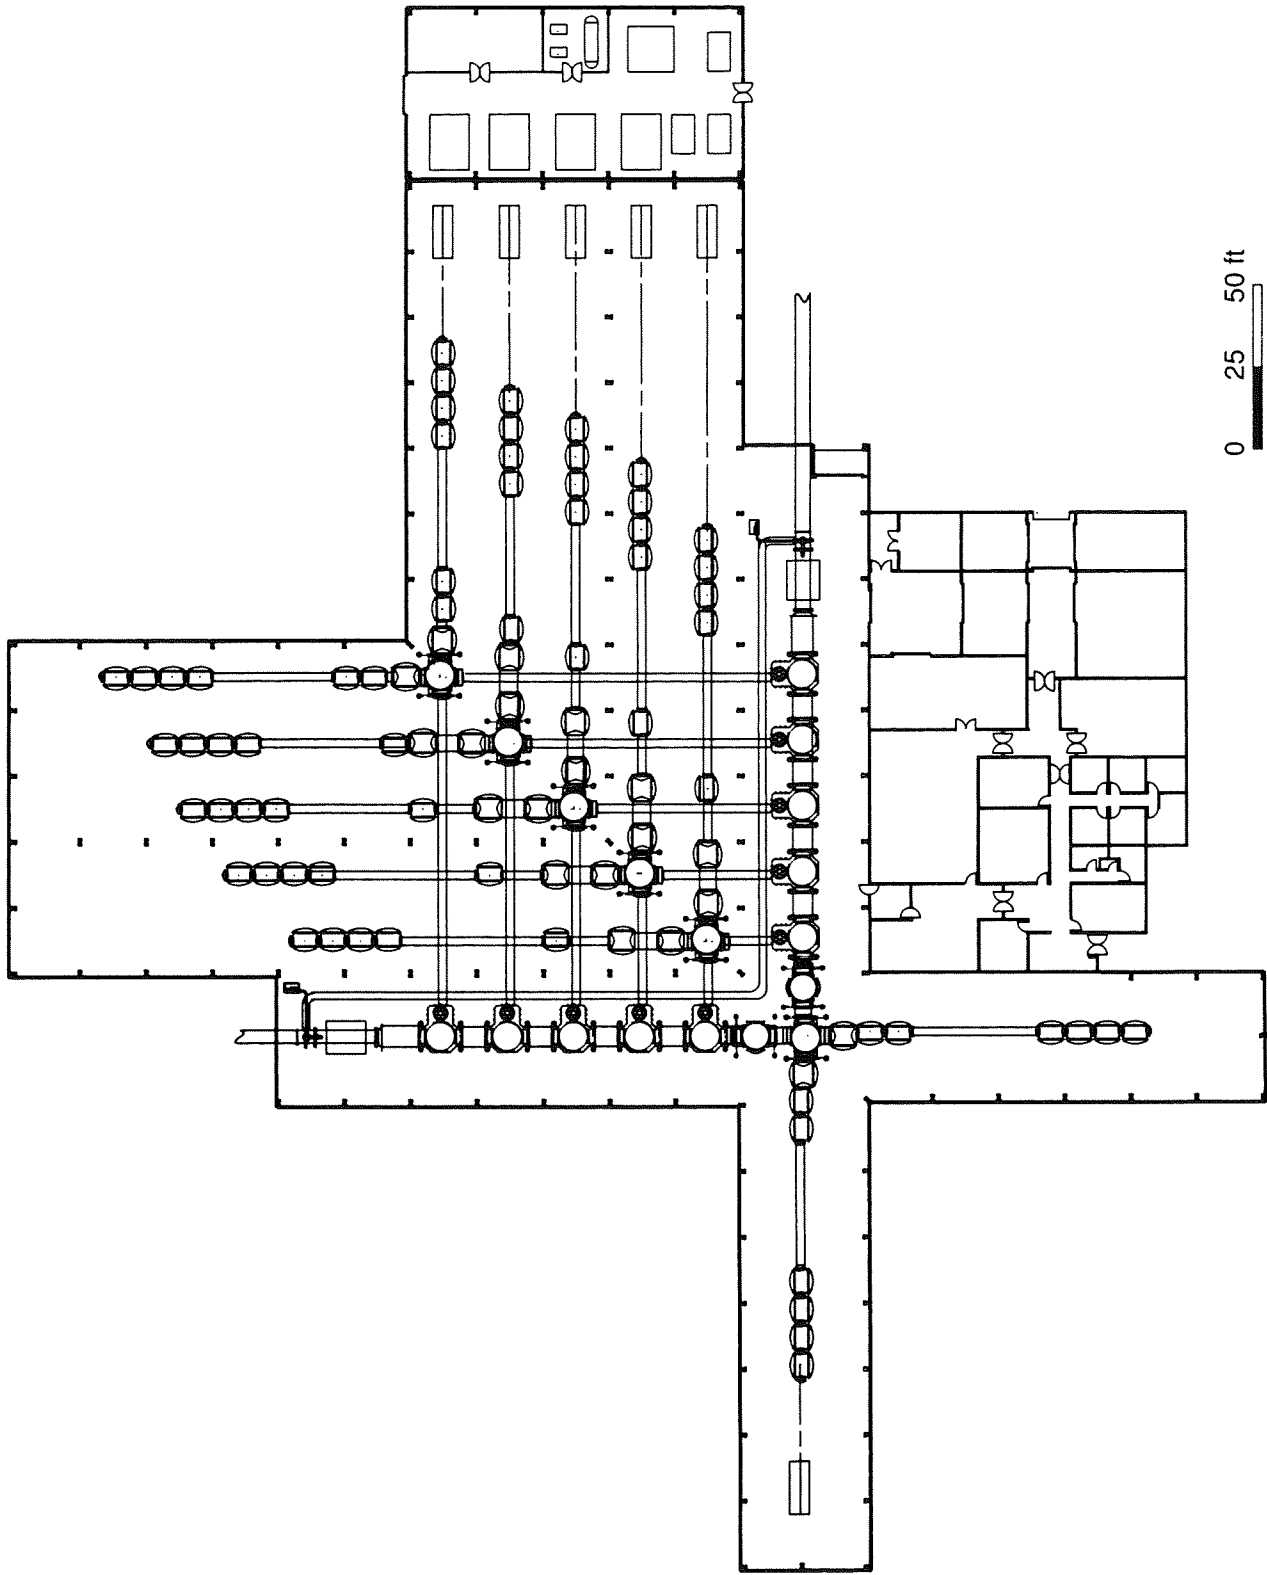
Floor plan for the Site 1 corner station in Phase C.
